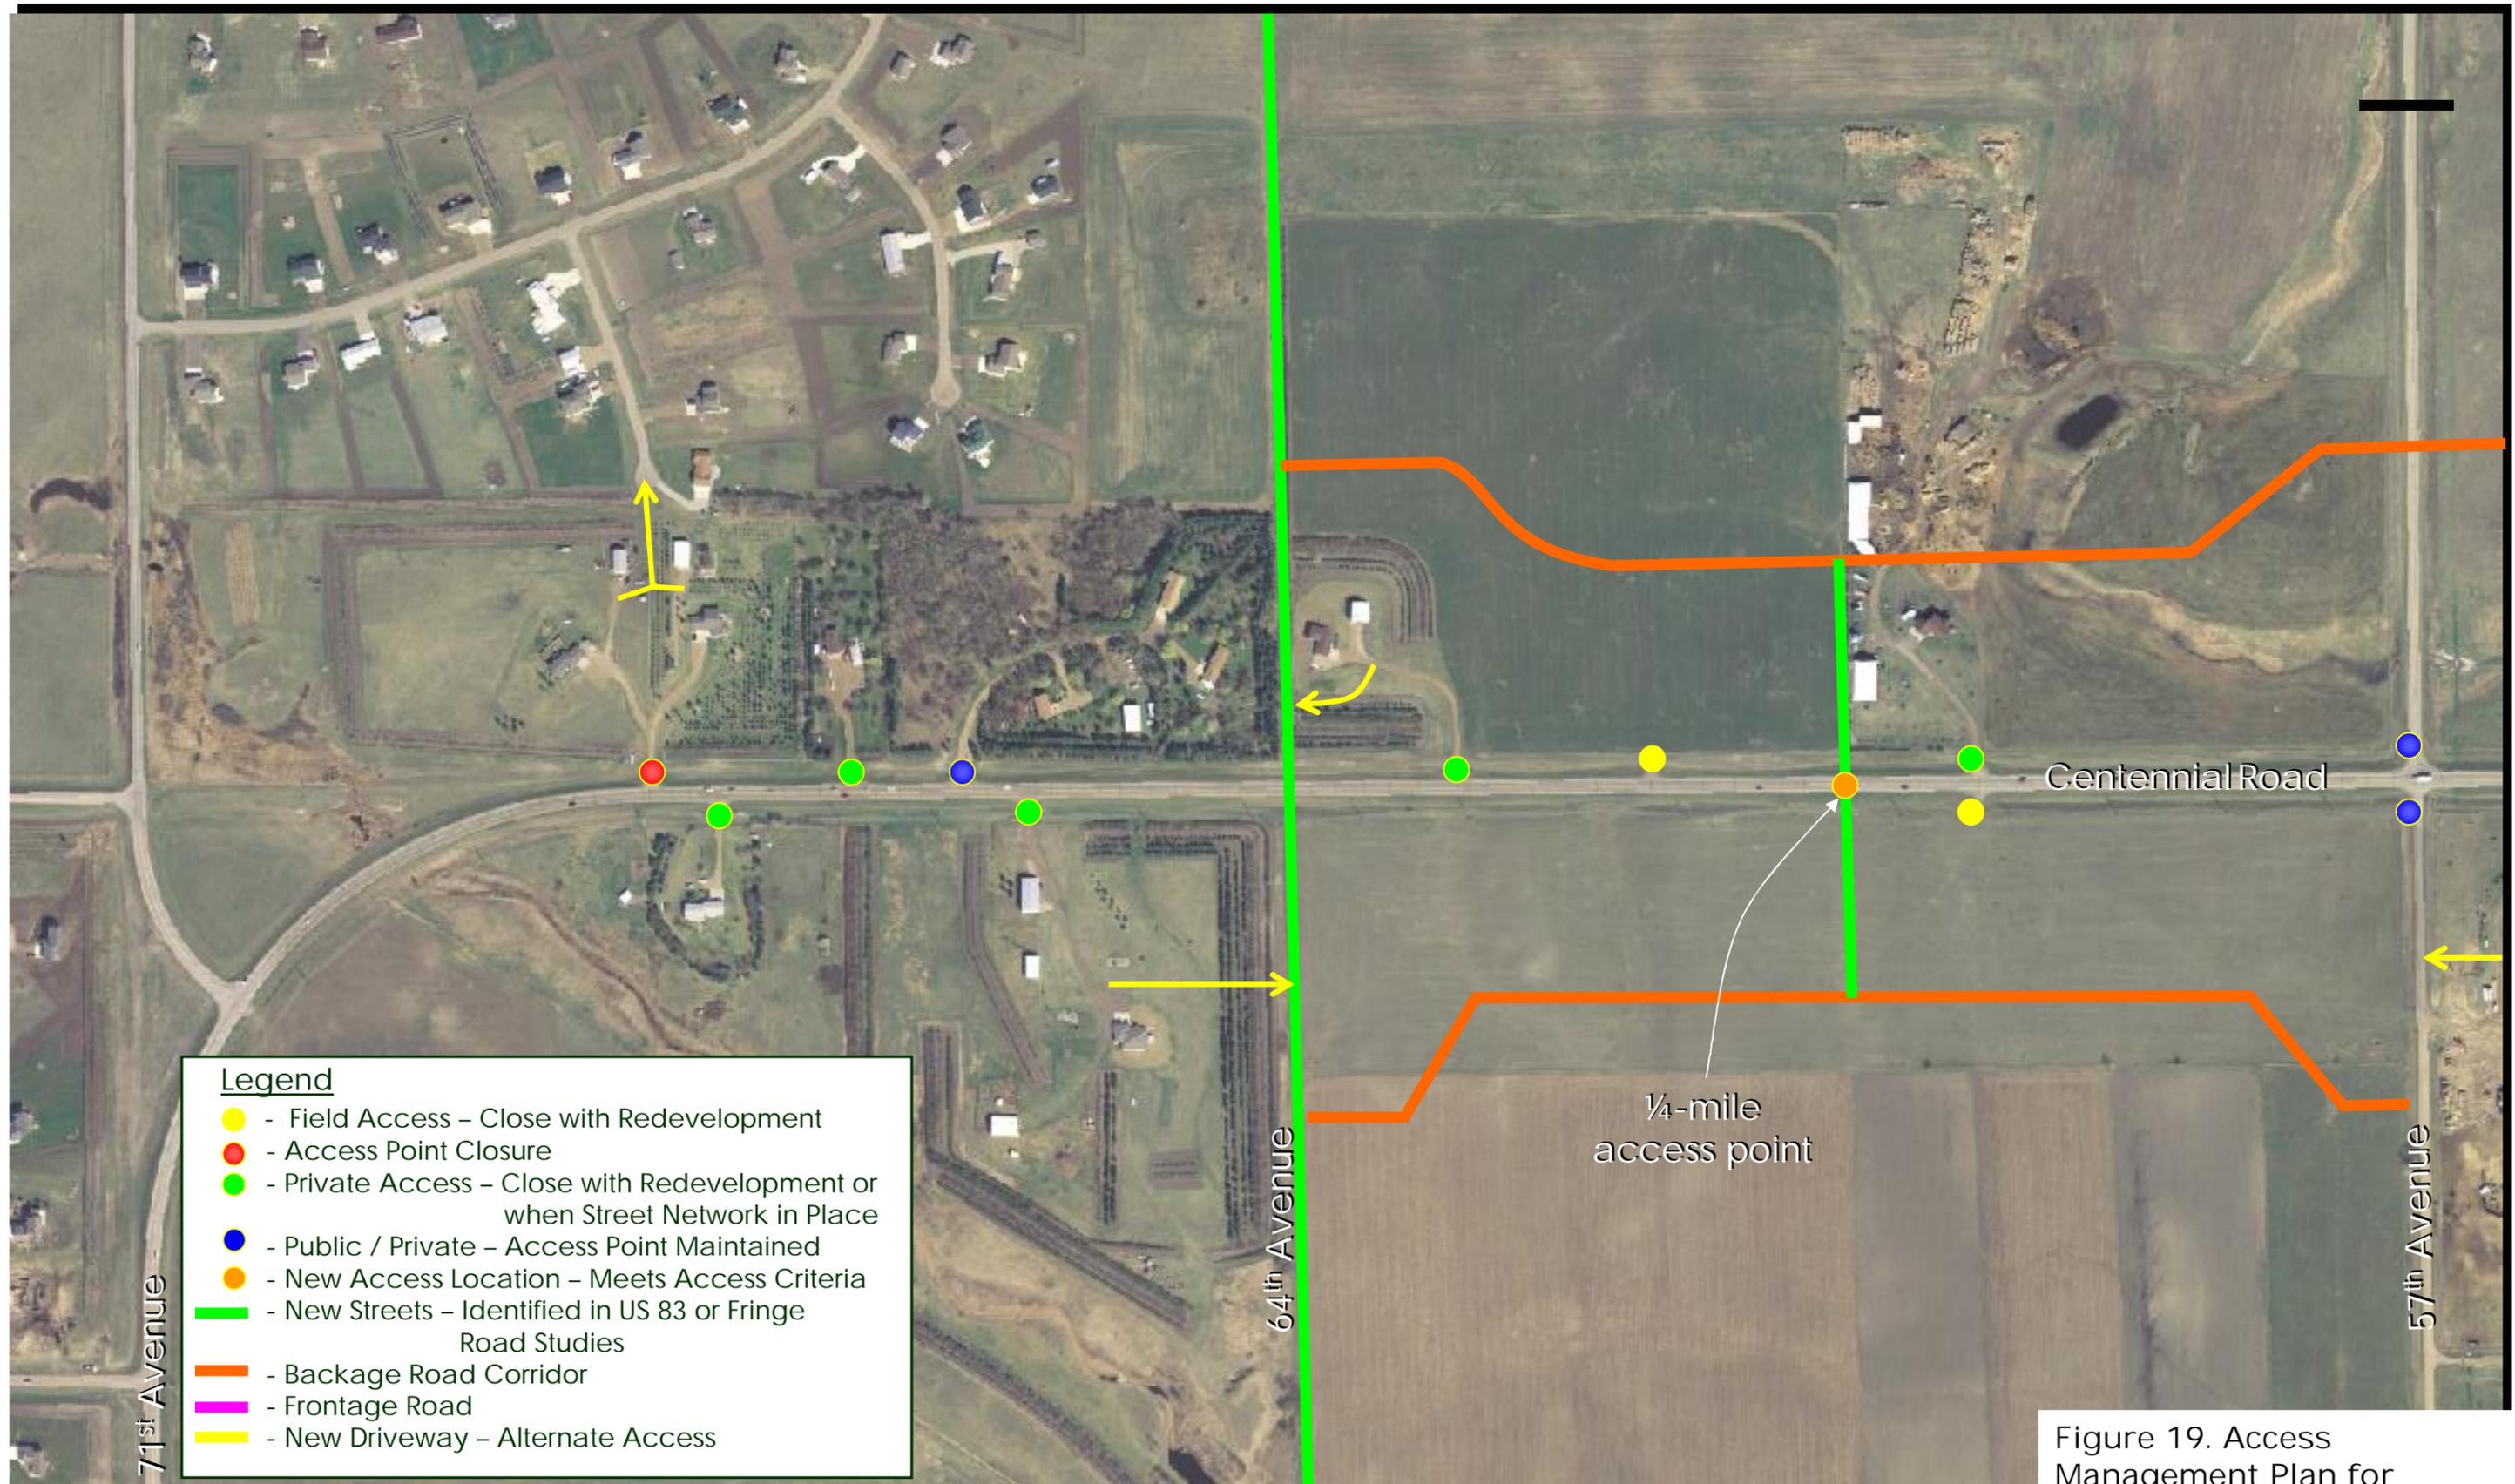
Access Management Plan for Centennial Road, 71st Avenue to 57th Avenue
